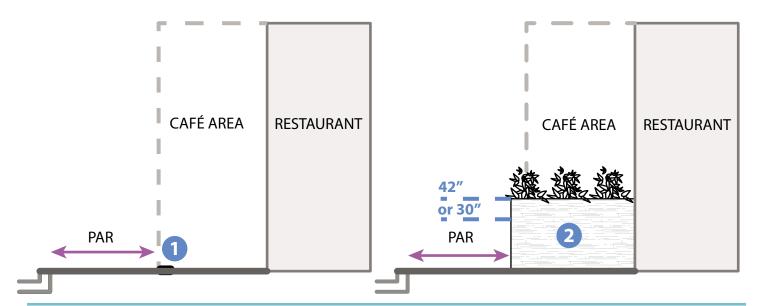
Elevation (Side) view of Sidewalk Café markers and barriers.
